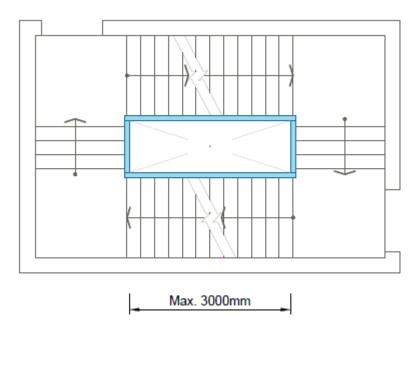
Dual wall system with vertical wall between horizontal walls – vertical Speedpanel base detail at mid-landings
